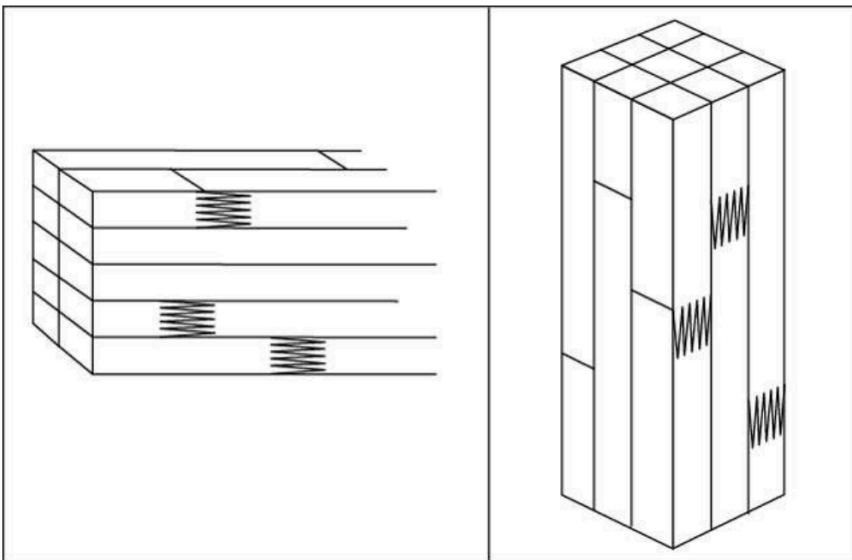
Examples of the product – finger-jointed, short-length, face-bonded laminations in a beam and a column
